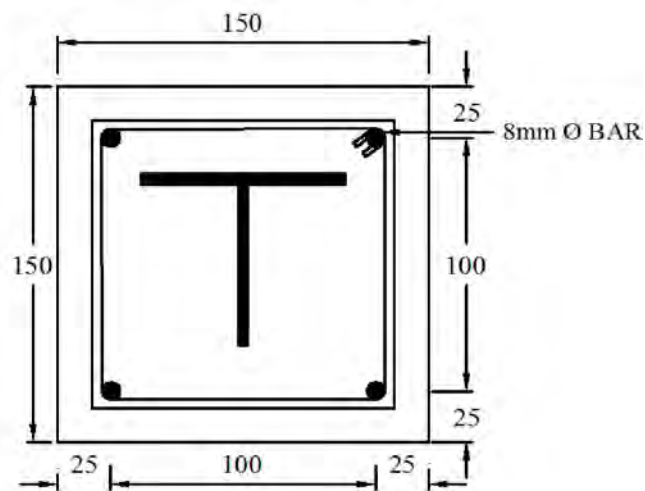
Typical cross section of FEC columns (Dundar et al. 2008)
